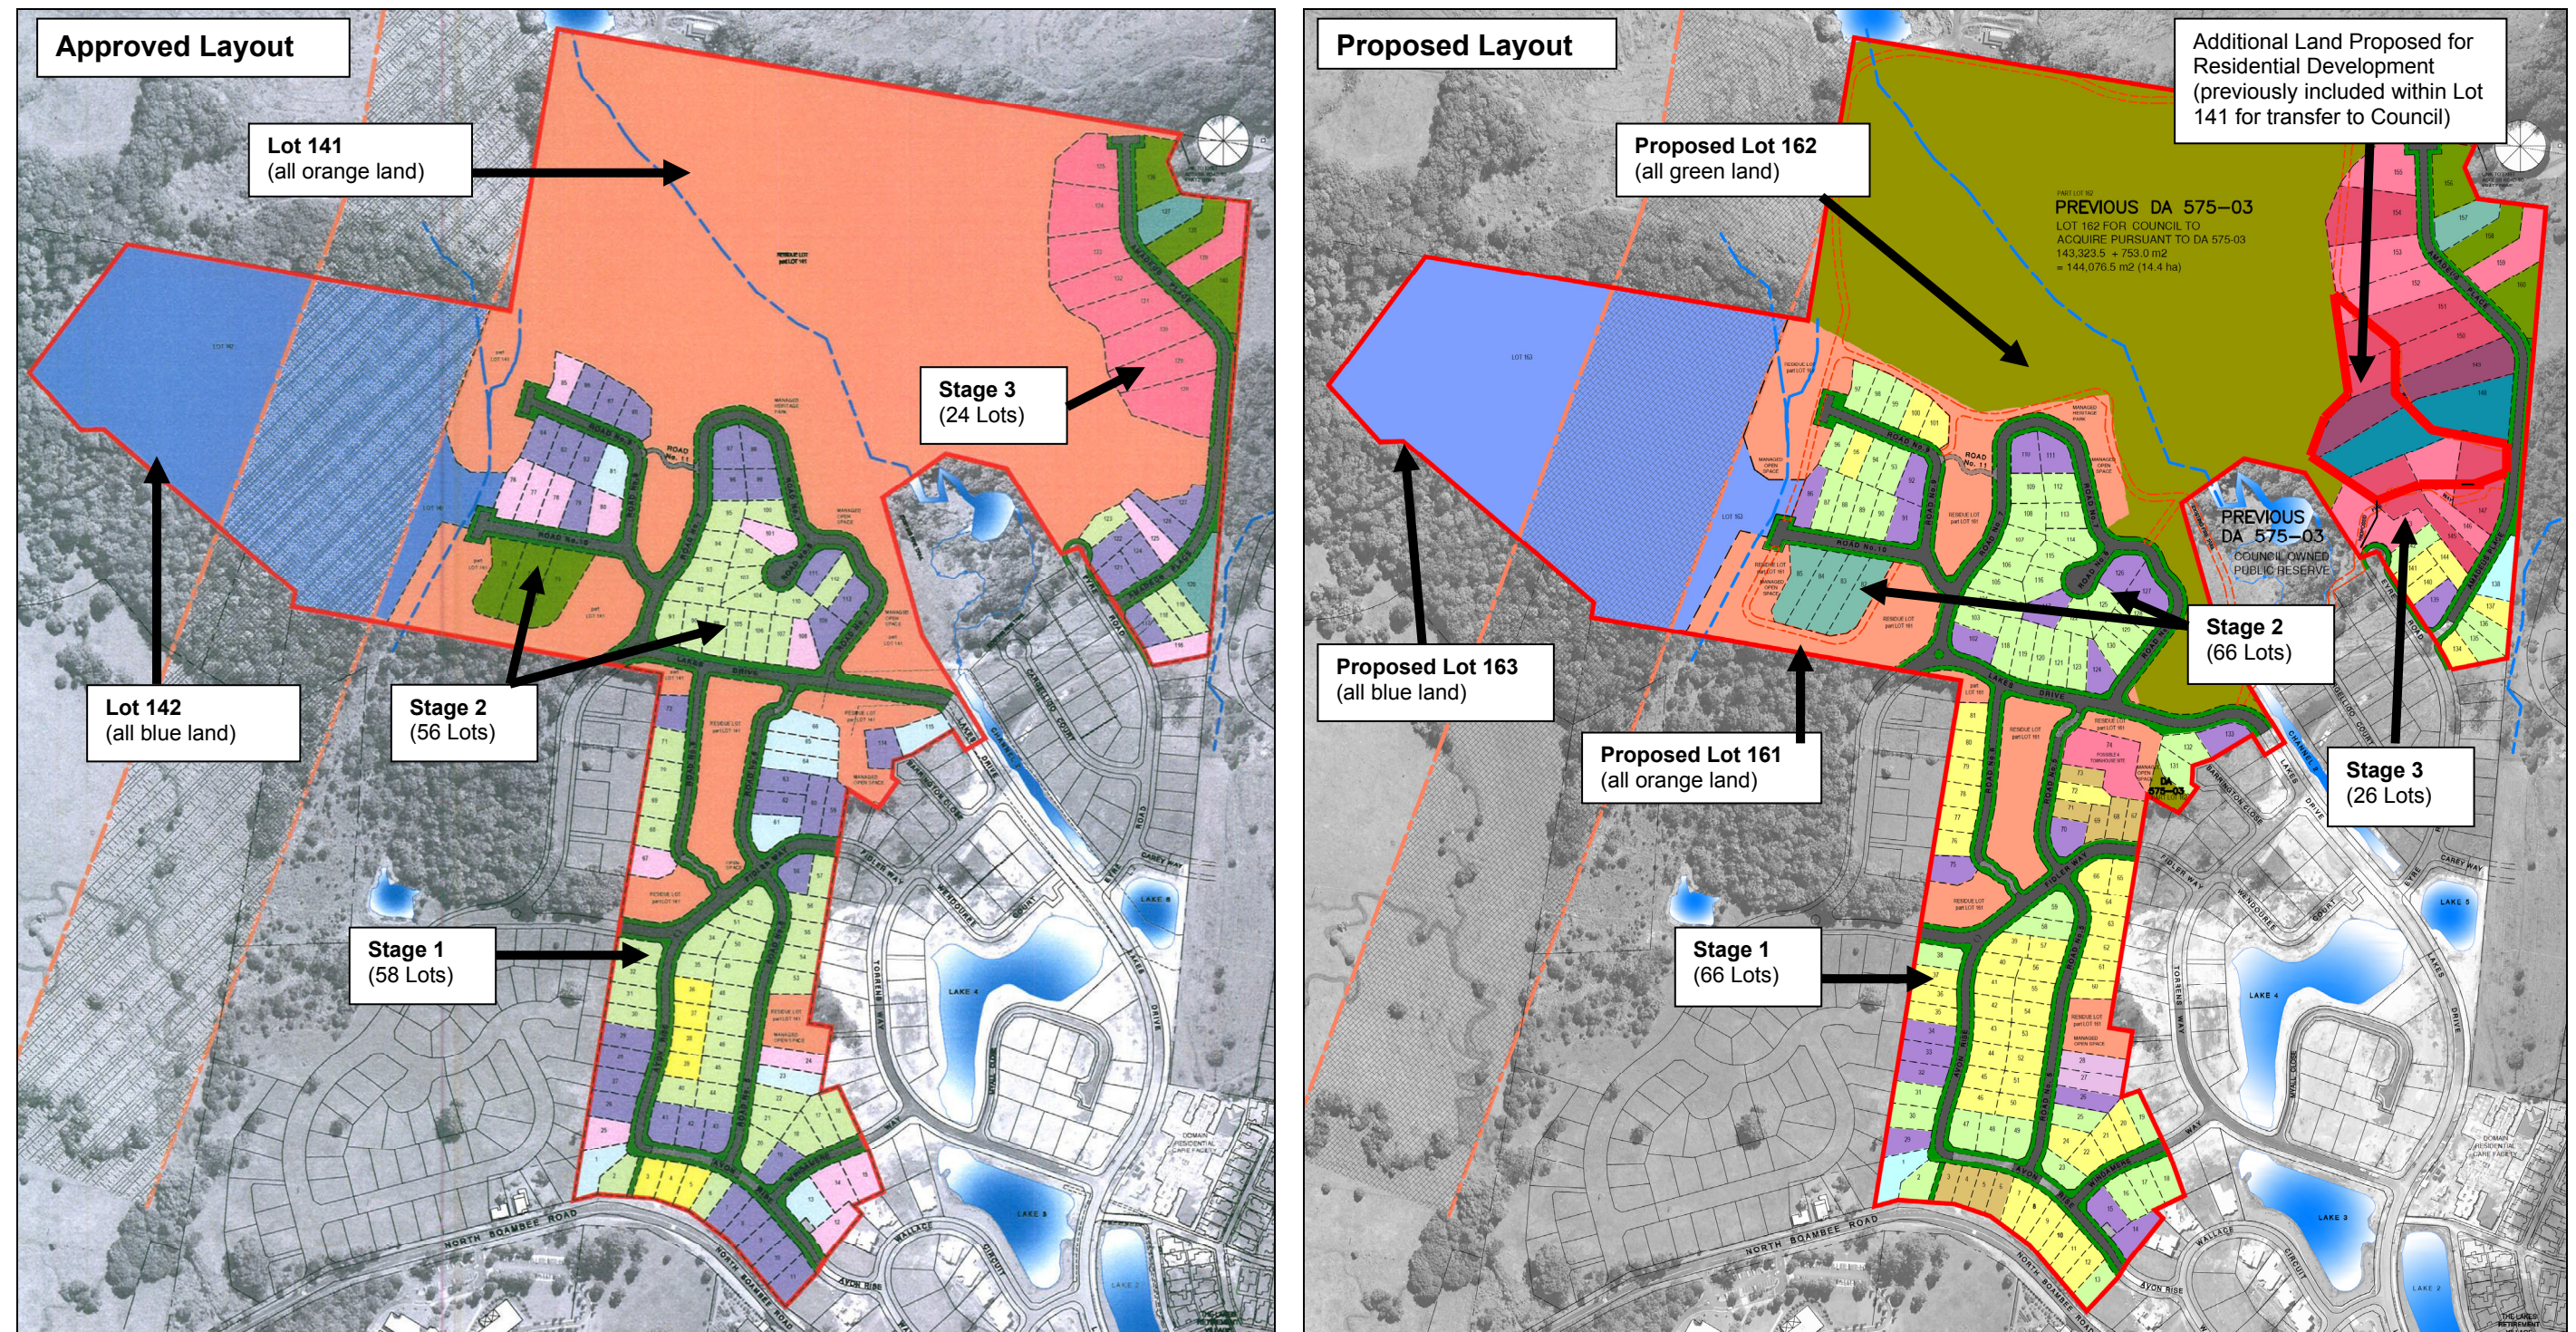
Comparison of Approved and Proposed Subdivision Layout (Approved Layout Left, Proposed Layout Right)
